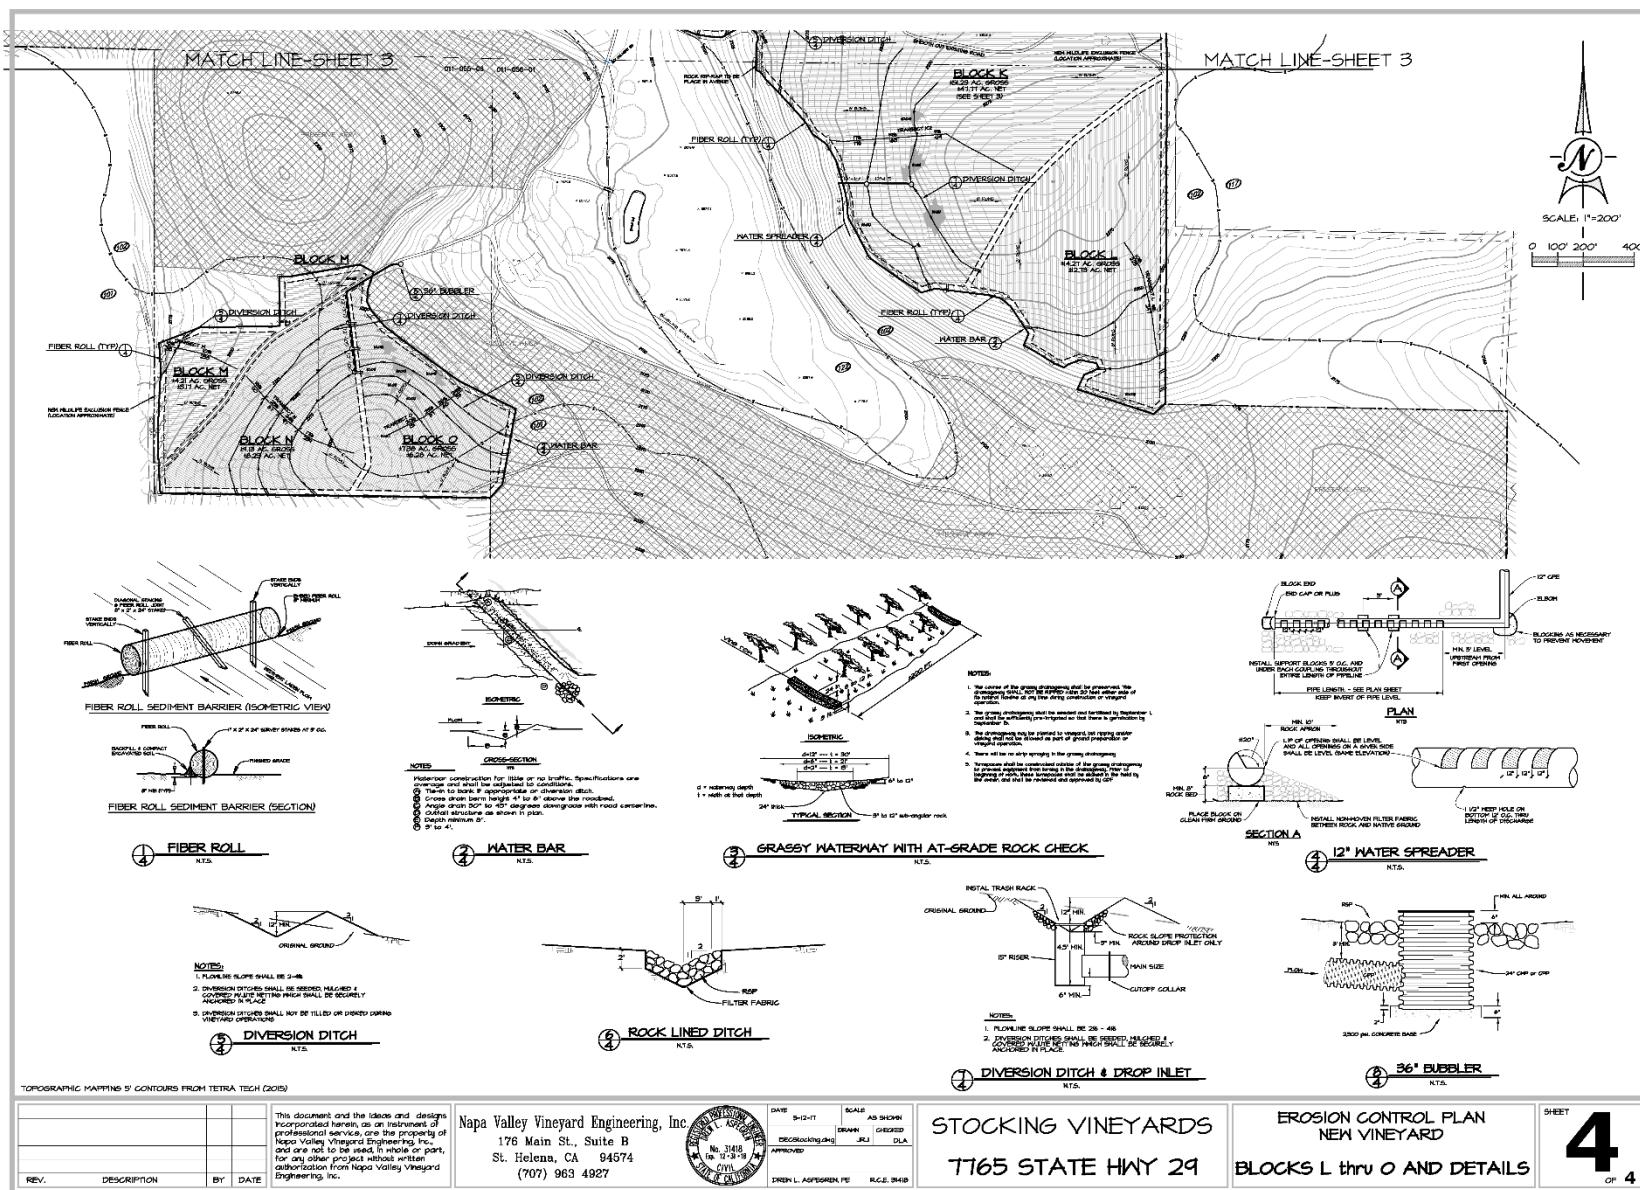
Stocking Vineyards Erosion Control Plan Page 4
